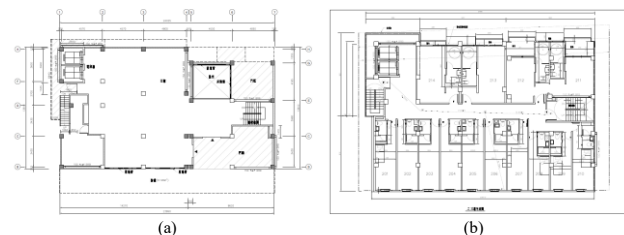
Plan view of Building A11: (a) first floor and (b) typical floor.
